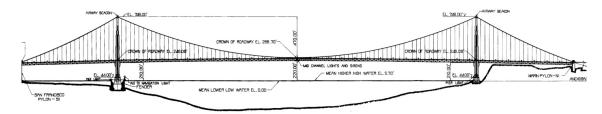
Architectural plan of the Golden Gate Bridge (Fgr5.1)
